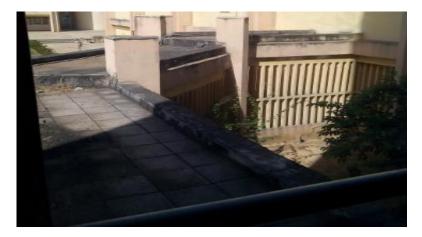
Plate XXV: Faculty Building Showing Extension of Columns for Future Expansion. Source: Author's fieldwork 2016
